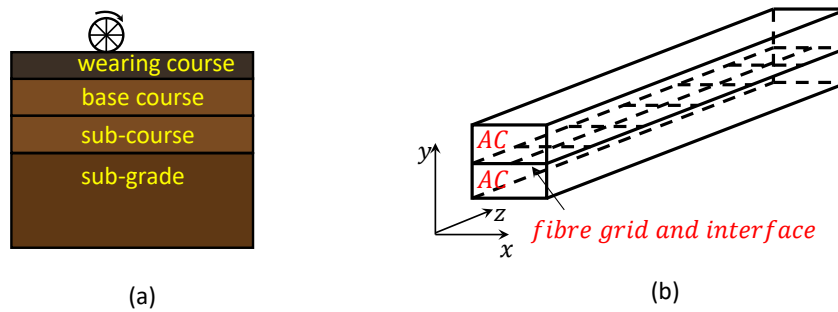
(a) Pavement cross section. (b) Zoom in the top layer of pavement and the grid between asphalt concrete (AC) layers.
